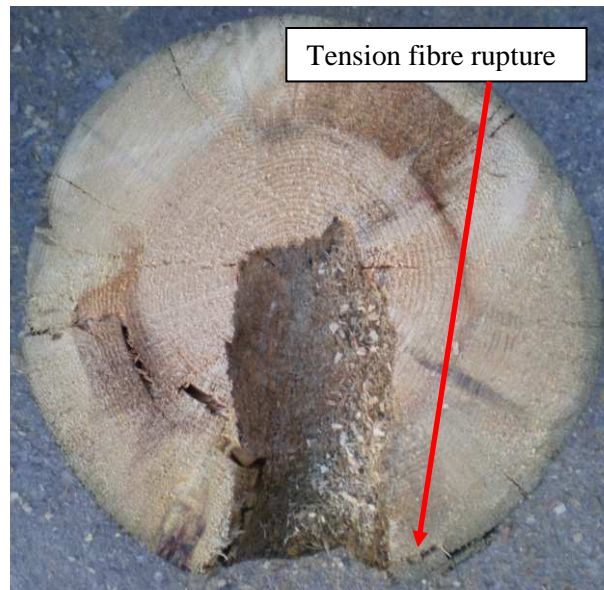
Cross-section of in-service specimen with tension damage (60-3-1).
